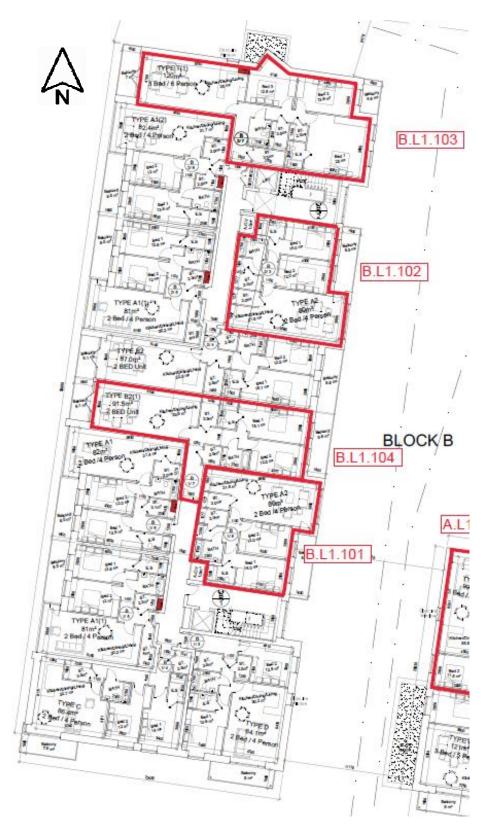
Floor Layout of the Proposed Scheme Block B – First Floor
